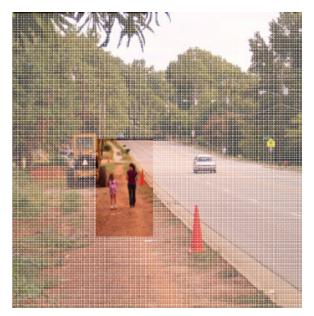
Poor pedestrian access at a construction site in Cary, NC.
